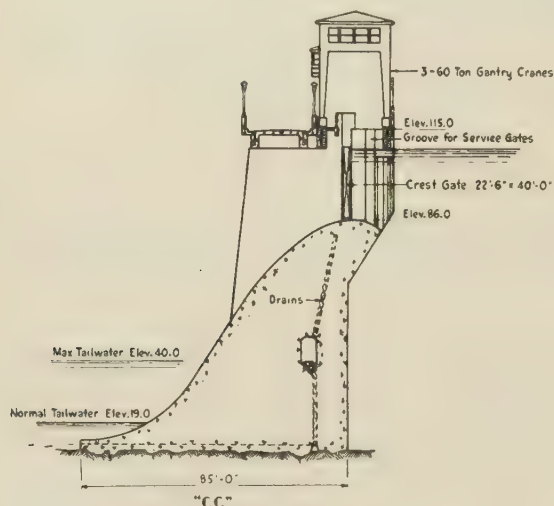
CROSS-SECTION OF MAIN SPILLWAY SECTION CONOWINGO DAM
